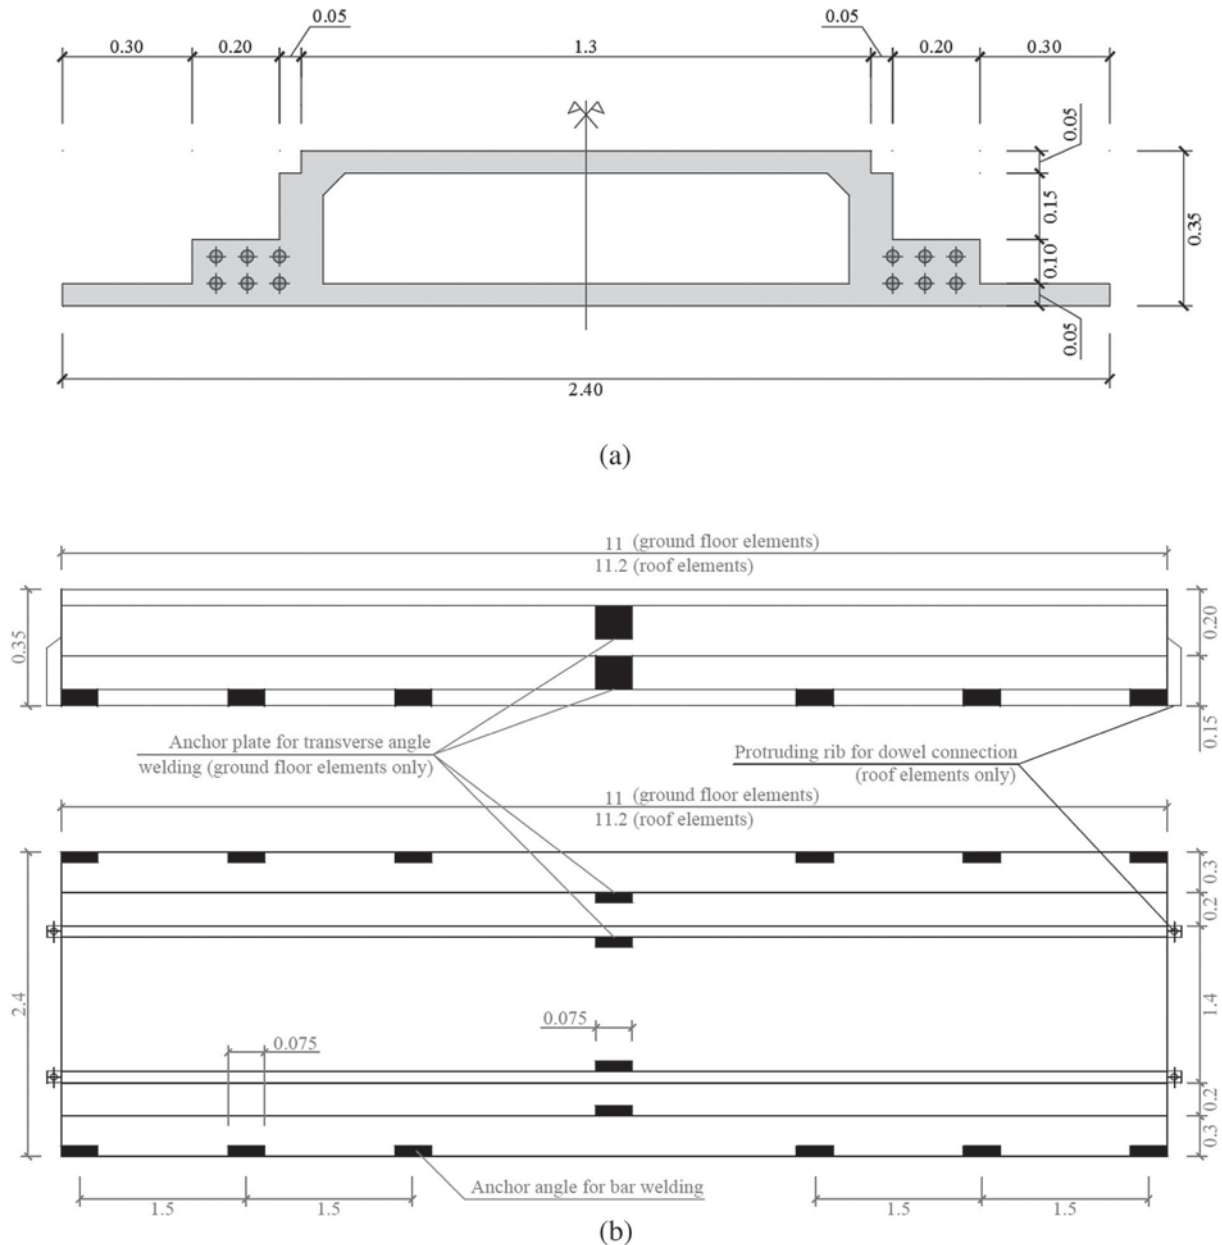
Prestressed (pretensioned) floor element: (a) cross-section with position of main prestressing tendons; (b) lateral and top views with positions of transverse floor-to-floor connections
